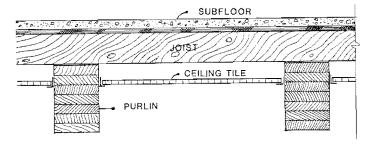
Cross-section through purlin showing position of ceiling and concealed portion of beam above it.
